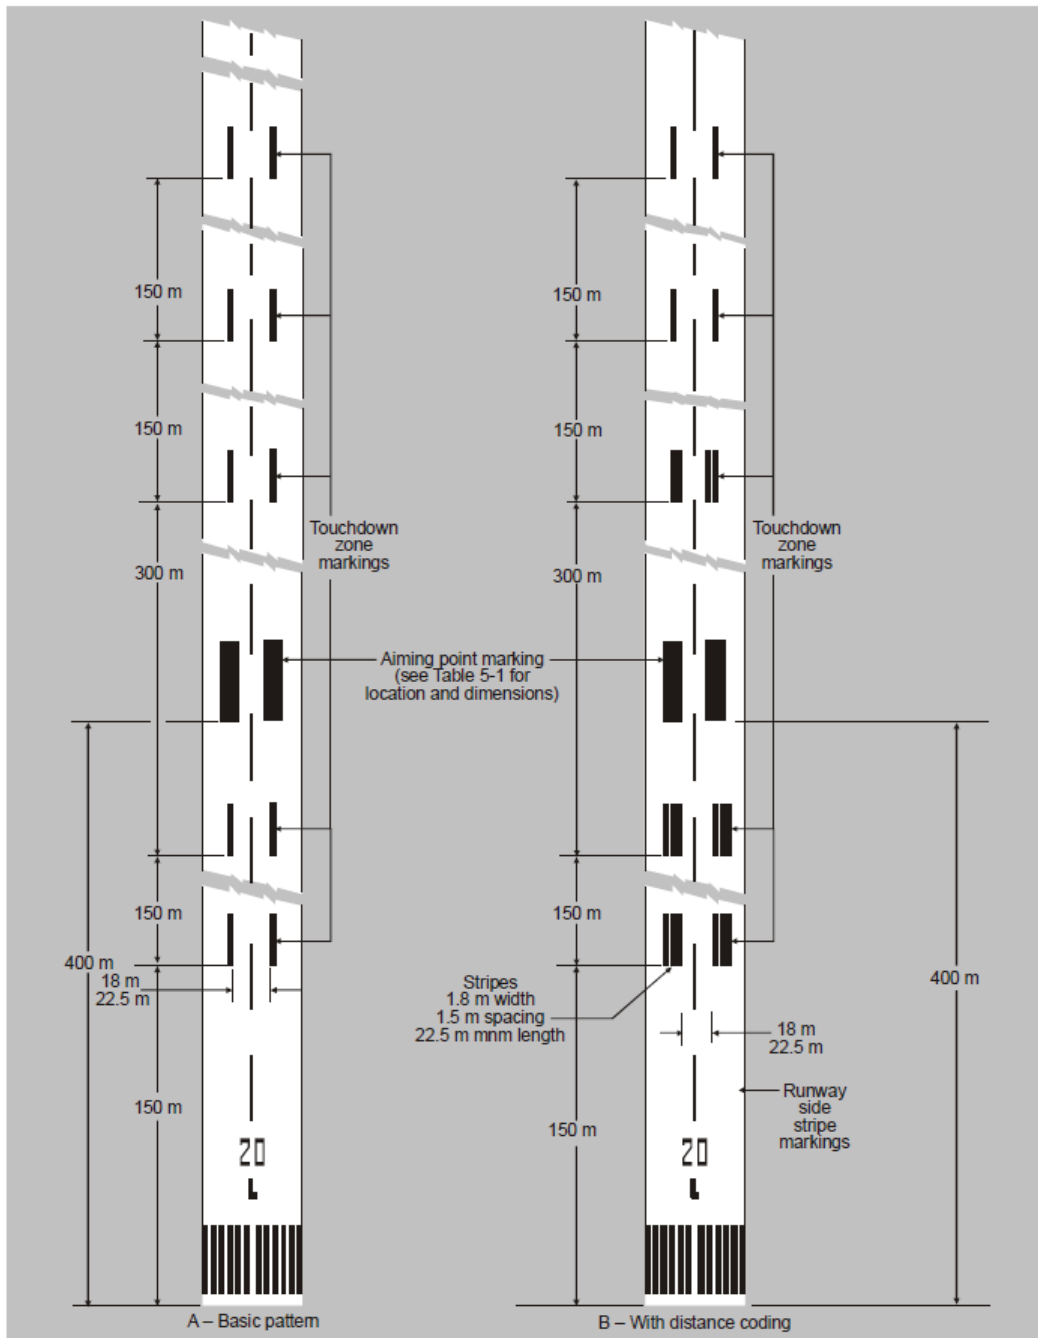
Aiming point and touchdown zone markings (illustrated for a runway with a length of 2 400 m or more)
